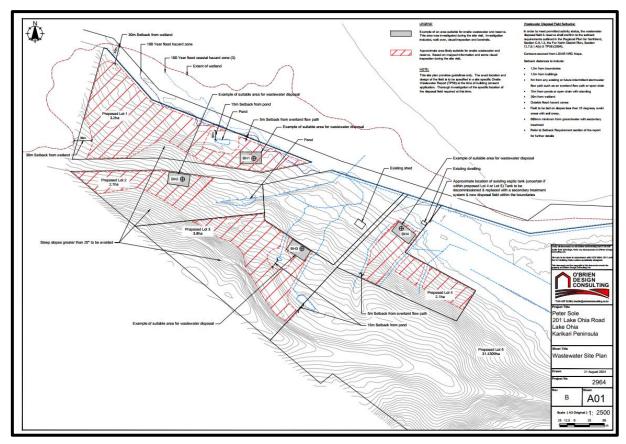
O'Brien Design Consulting Site plan indicating suitable areas for wastewater disposal.
